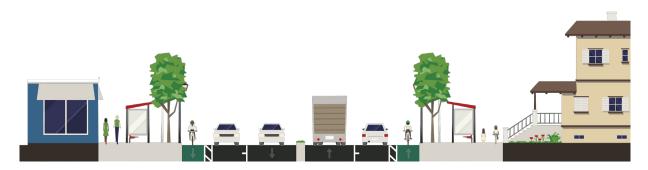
Example of "Complete Streets" elements (Streetmix.net)
